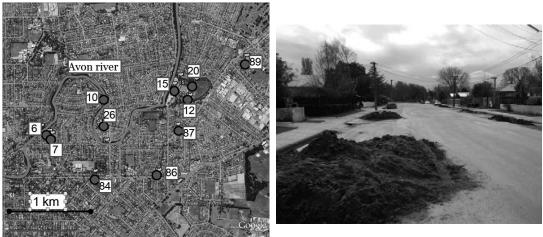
Survey map of Dallington area in Christchurch Photo 5 Boiled sand was placed at side of the street. city (Site 6 in Fig. 6)
